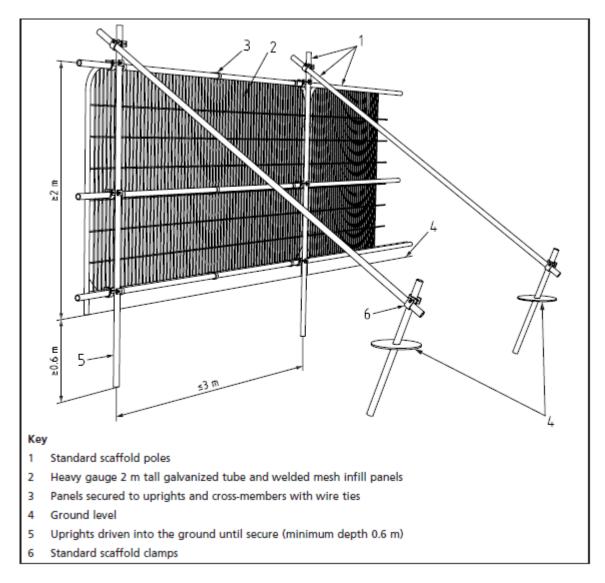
Tree Protection Barrier Specification (Source: Figure 2 from BS5837 - Default specification for protective barrier)
